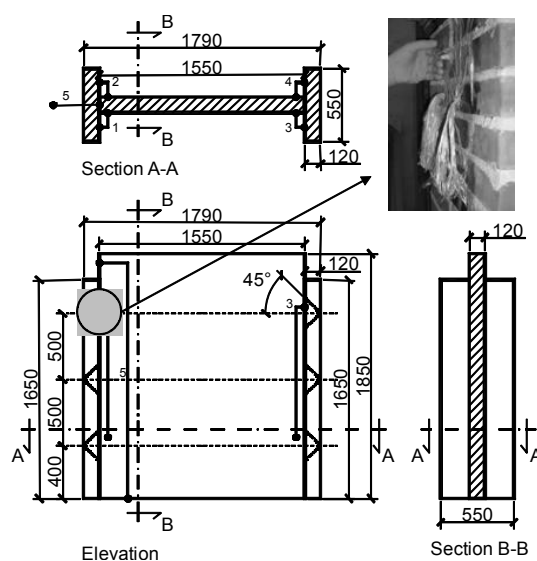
Displacement transducers on a masonry wall prototype. At top right the anchorage detail of the bars
